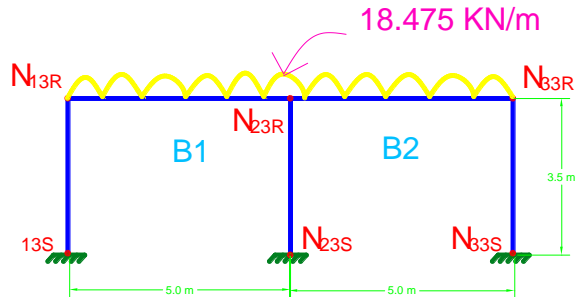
Substitute Frame -1 for the Terrace Floor Beam B1 - B2 (TSF1)
